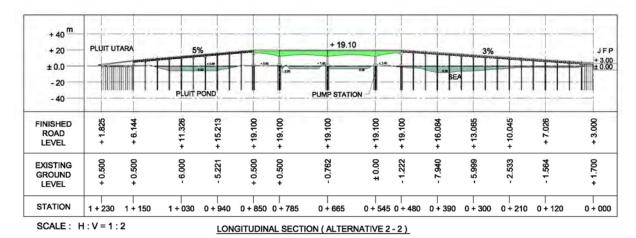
Longitudinal Cross Section of Alternative 2-2 (Image)
